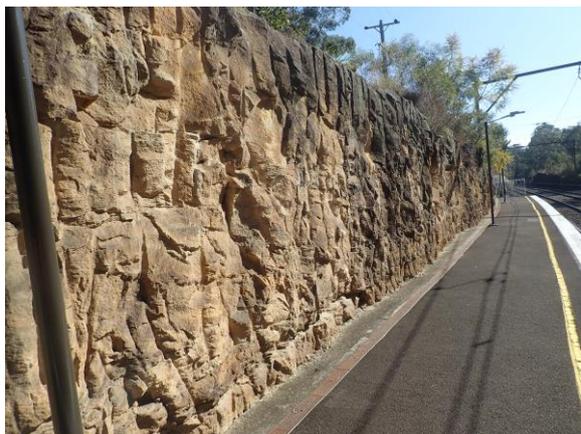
Sandstone that has been cut into for construction of the rail corridor. View looking to north.
